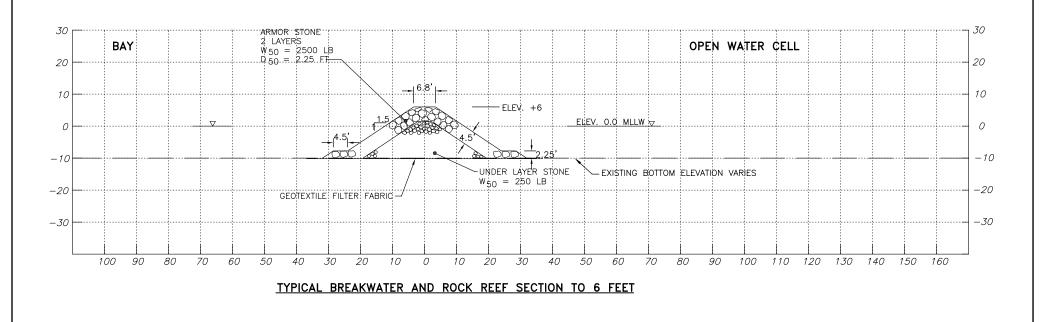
Typical Segmented Breakwater and Rock Reef Section
